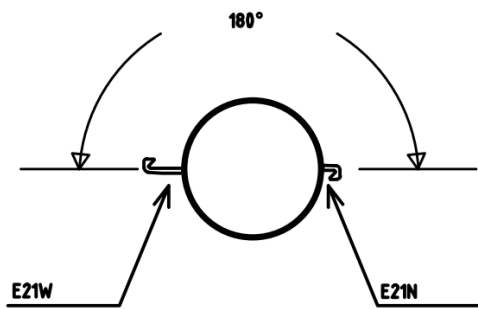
The interlock type used in the RD pile wall in the Länsimetro Urheilupuisto project. Picture: Ruukki
